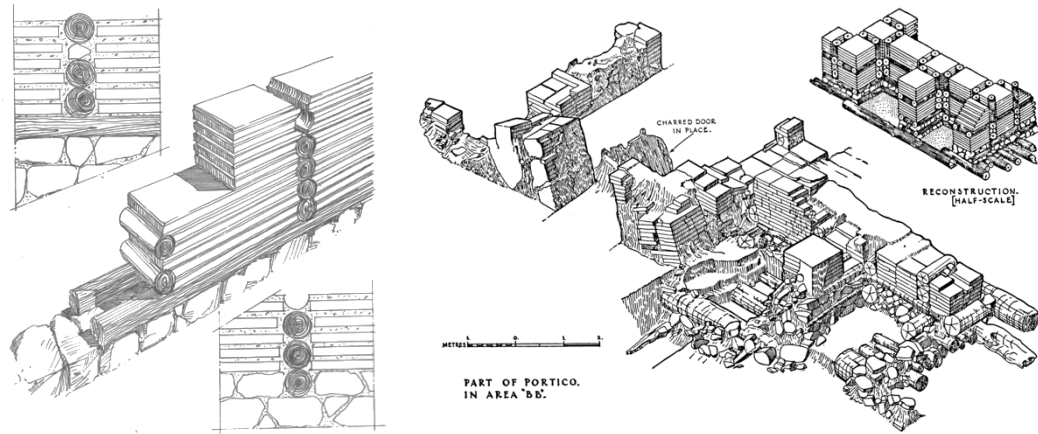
Kültepe/Kanesh, horizontal beams located perpendicular to the wall surface in mudbrick masonry with parallel beams between the stone footing and the mudbrick wall [11] (a; left) and Beycesultan, horizontal beams in mudbrick masonry in Level II [12] (b; right). The timber beams are circular in section with little shaping, if any.
